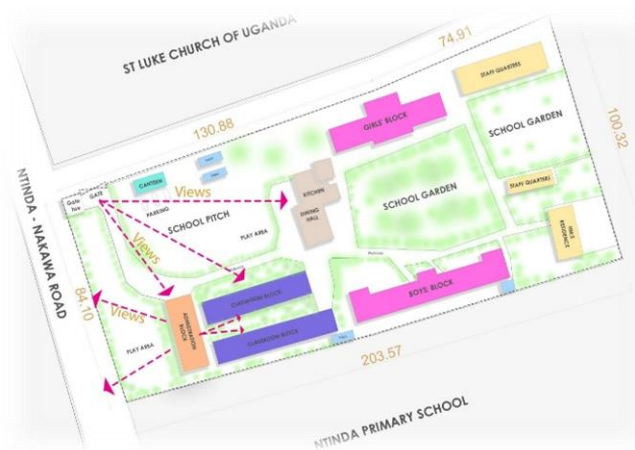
Site plan of the existing school showing clear sight lines towards the school facilities.
